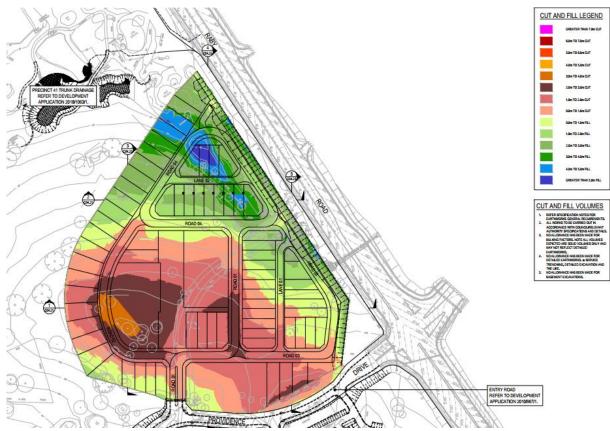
Extract of Cut and Fill Plan (Source: Enspire)
